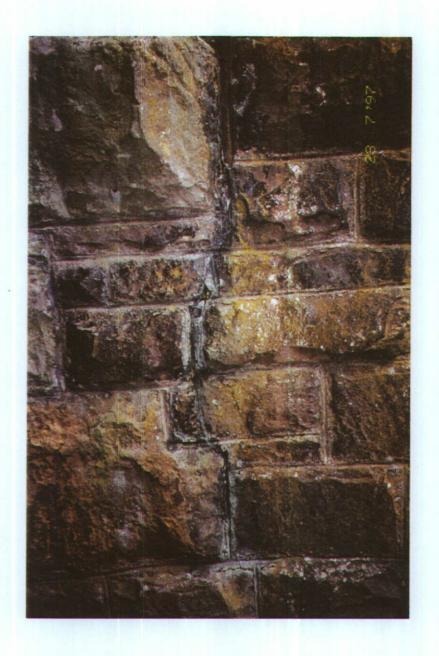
VERTICAL CRACK TO NORTH ABUTMENT
